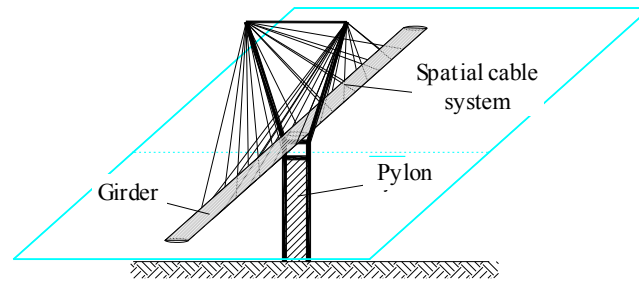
Sketch of possible pylon configuration for spatial cable system in a Cable Supported Bridge.
